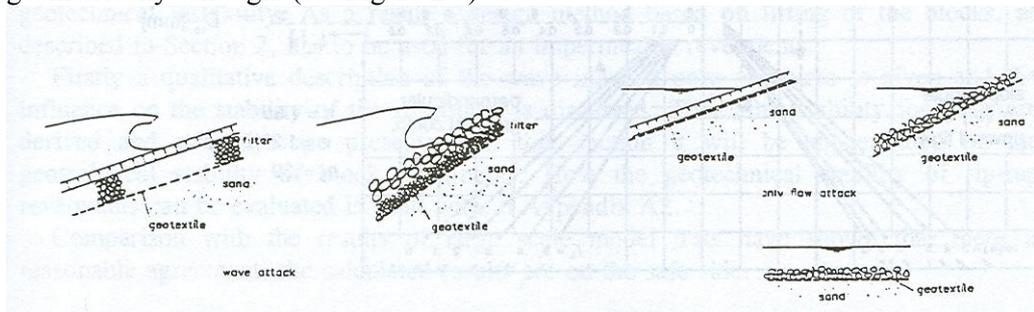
Examples of structures in which hydrodynamically sandtight geotextiles can be applied (Source: Klein Breteler & Bezuijen, 1998)
